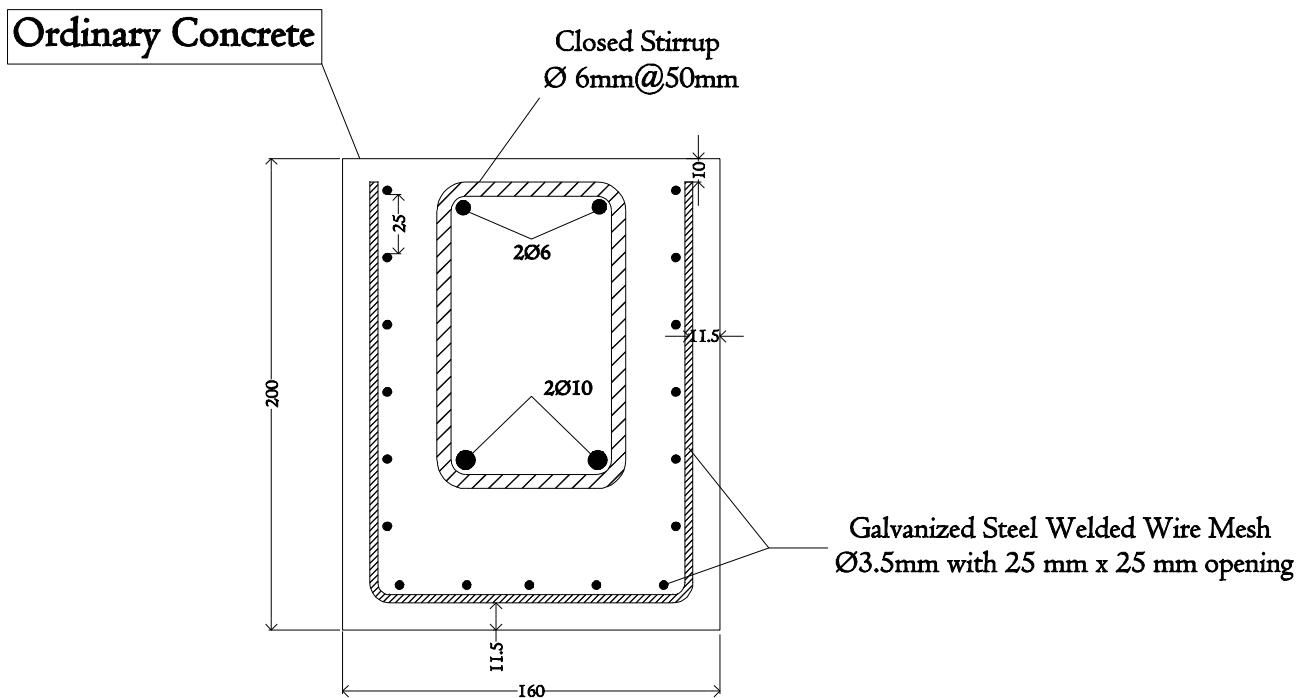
Monolithic beams MA.B1 and MA.B2 cross section (mm).
